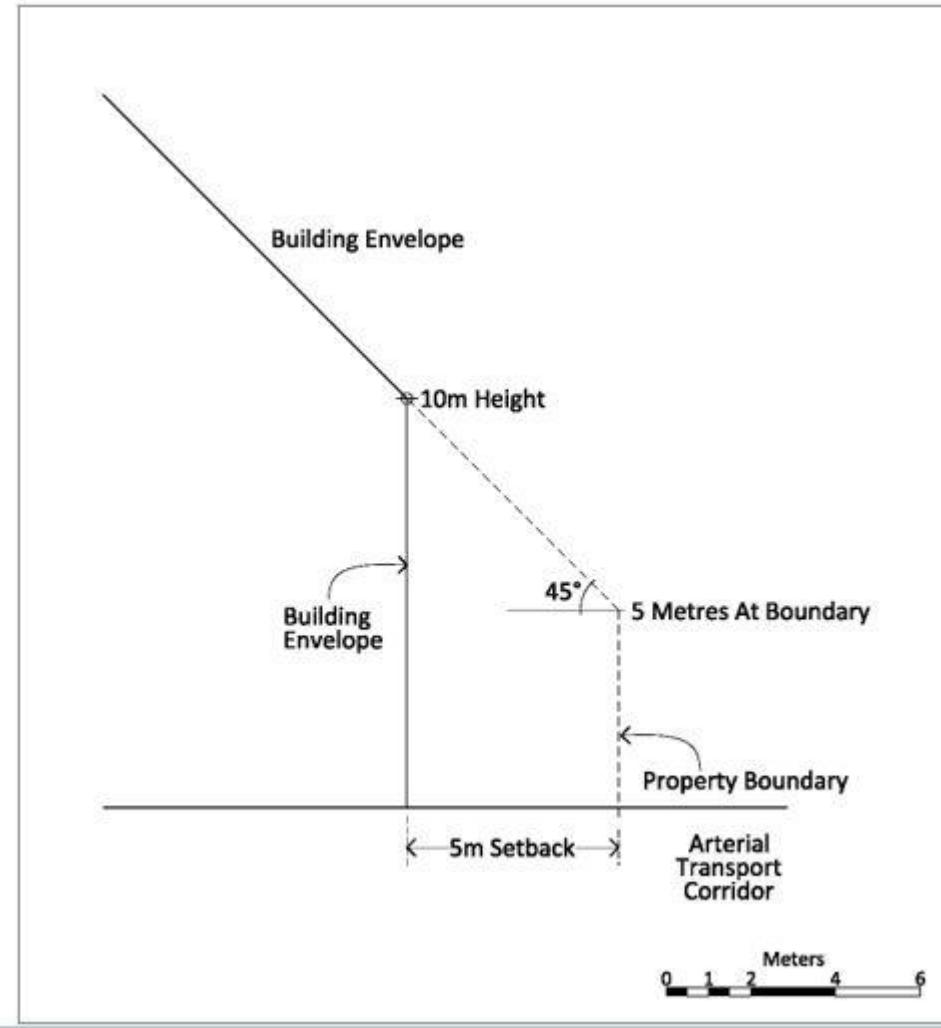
Building envelope for buildings located on an Arterial Transport Corridor
